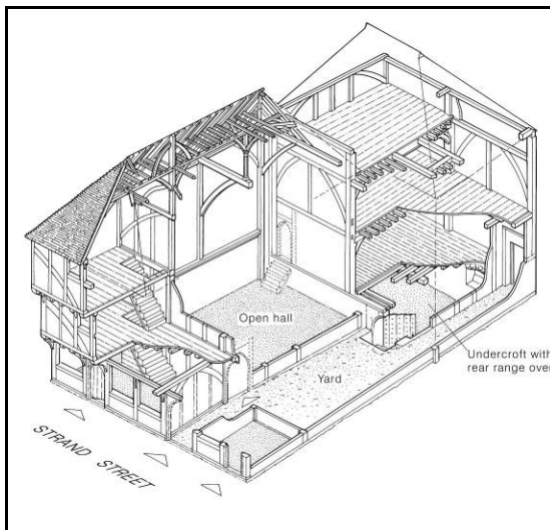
Reconstruction of 39 Strand Street (Allan T. Adams)
